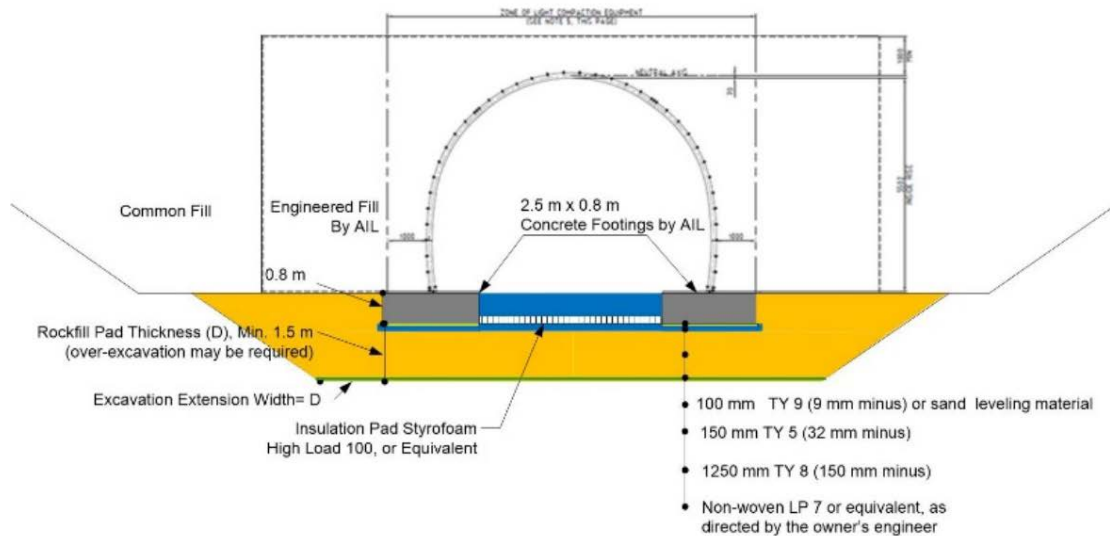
Typical Rockfill Pad Configuration for Load-out Tunnel
